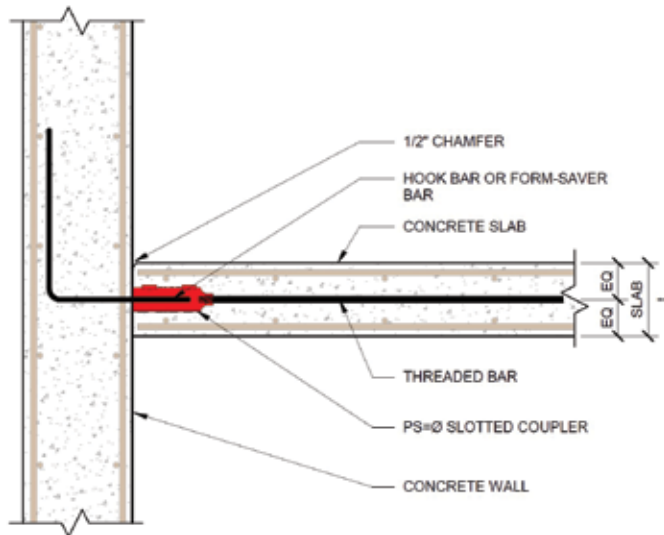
PS=Ø slab-to-wall restraint relief joint
